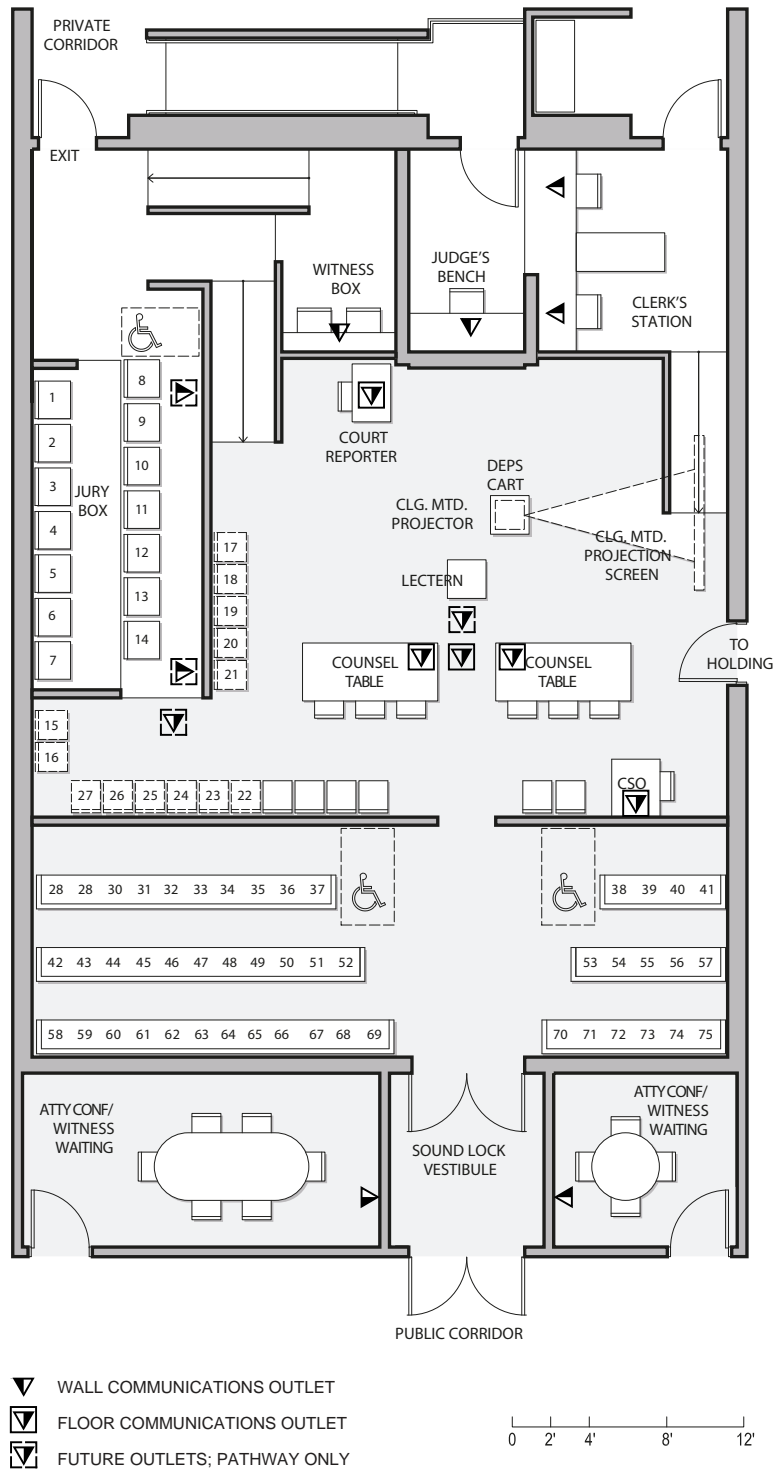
Multipurpose Courtroom With Center Bench Showing Outlets
